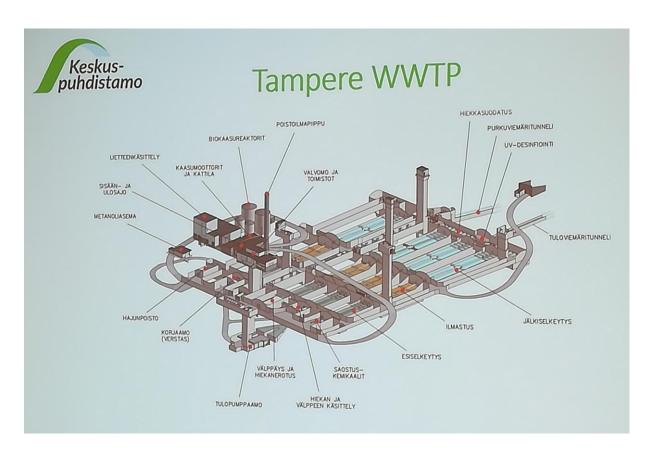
Underground waste water treatment facility in Tampere (Finland)
